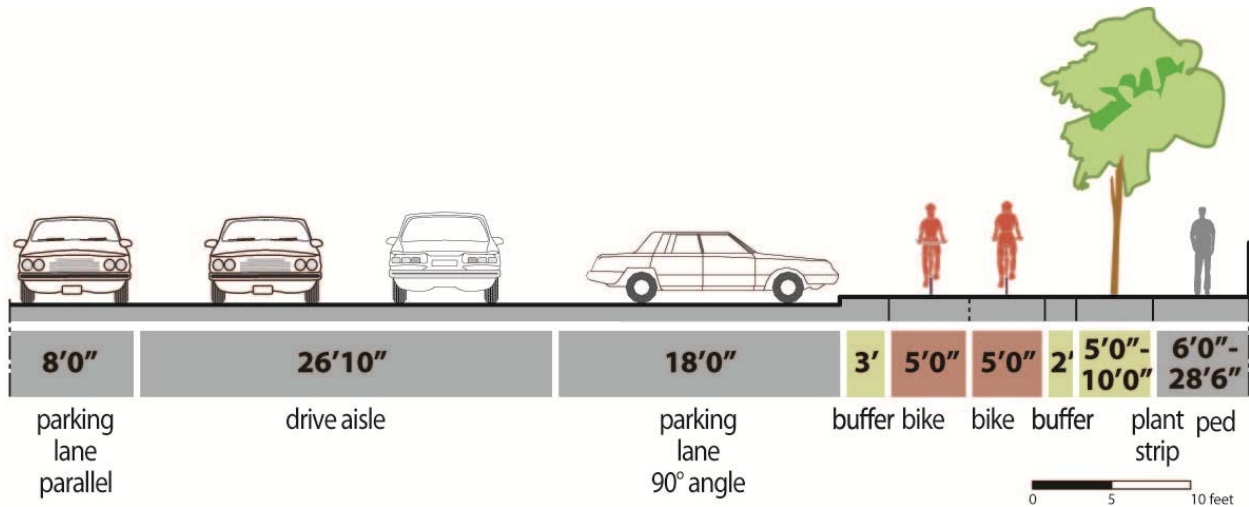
Segment 1F Parking Lot 4 North Proposed Improvements
